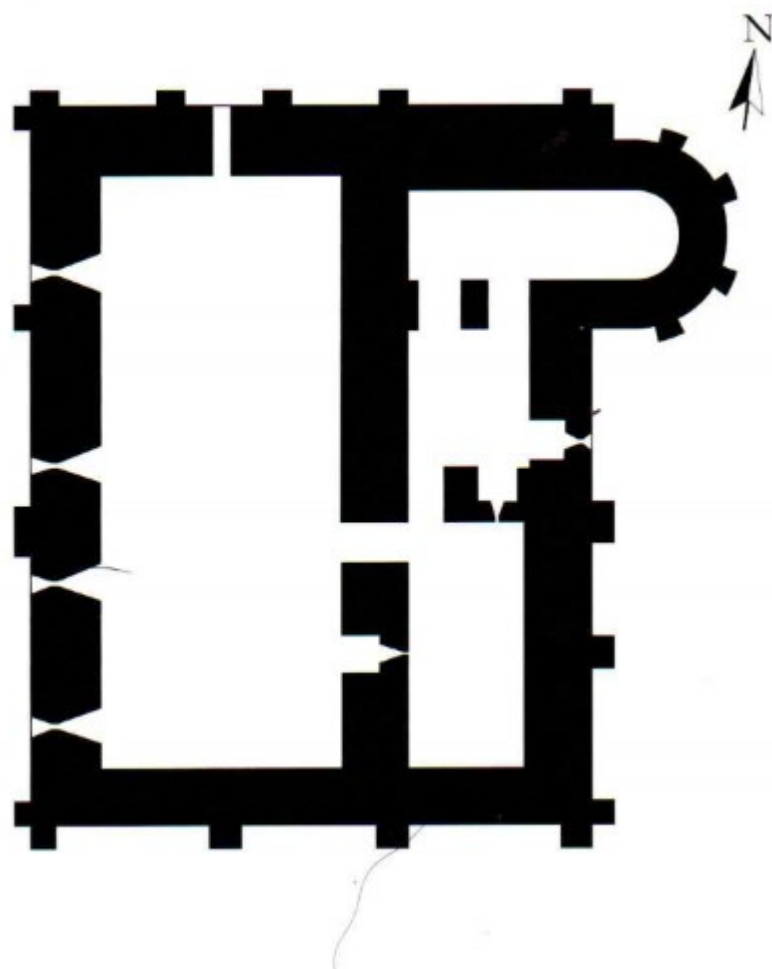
Ground floor plan of Ivry la Bataille, Normandy. Image via Goodall, 2011.
